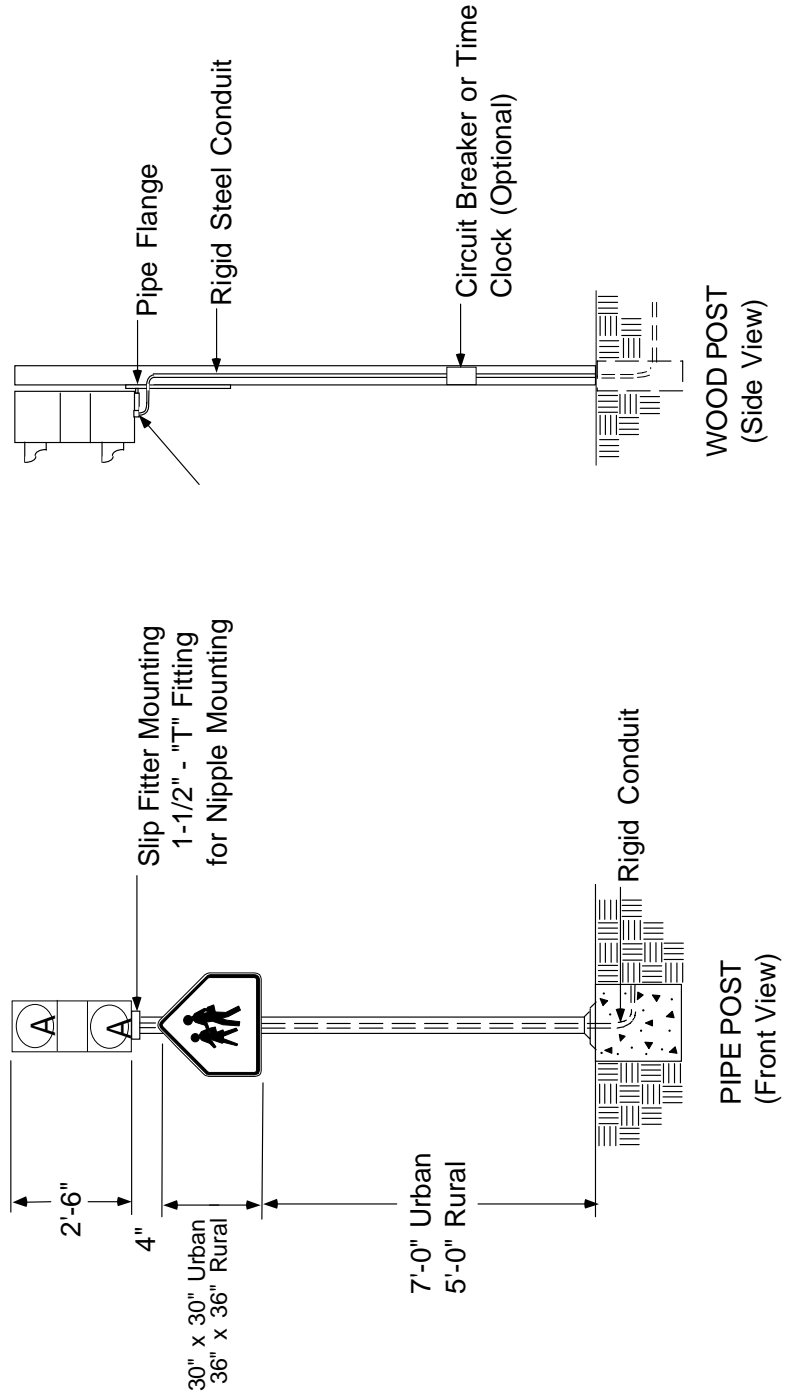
Typical Flashing Beacon – Warning Sign Installation For School Crossings
